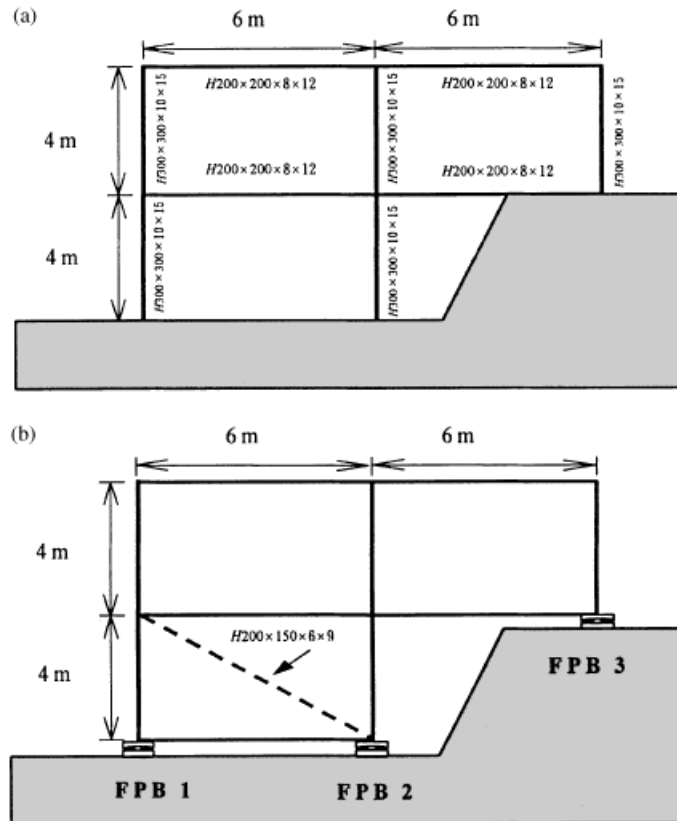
(a) Building on a stepped foundation without isolation, (b) building on a stepped foundation with isolation.
